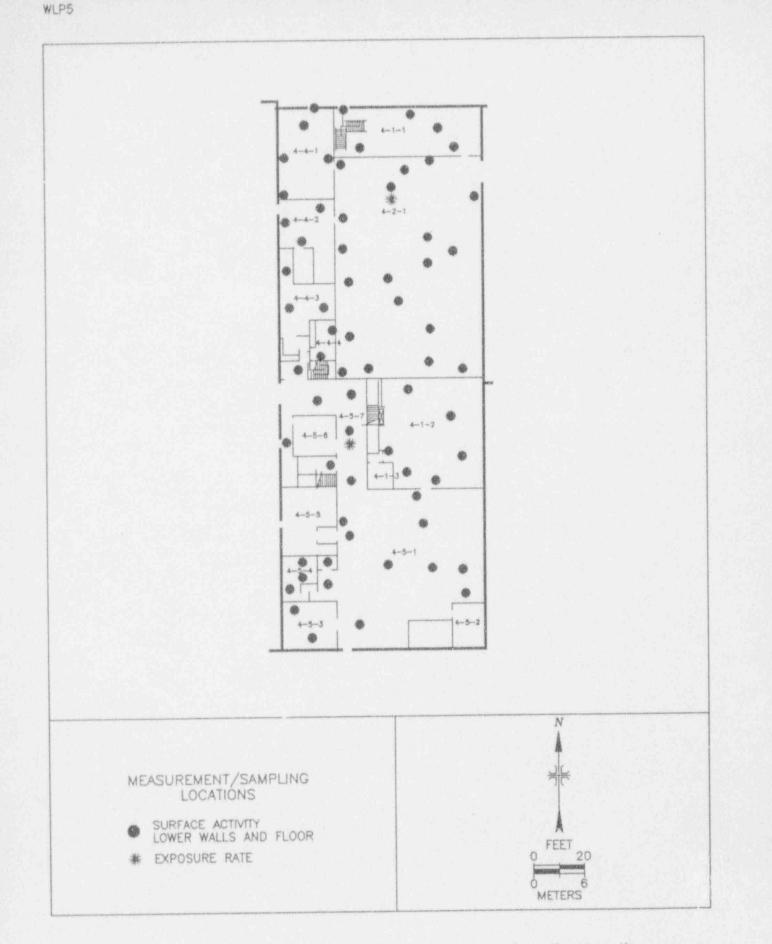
Building 6, First Floor - Measurement and Sampling Locations
